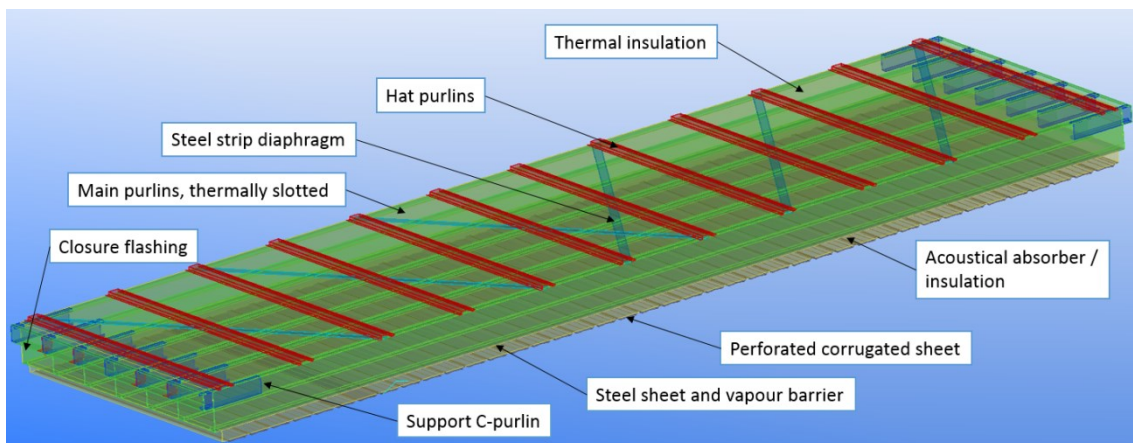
Arctic roof element with roofing sheets and hat profiles attached.
